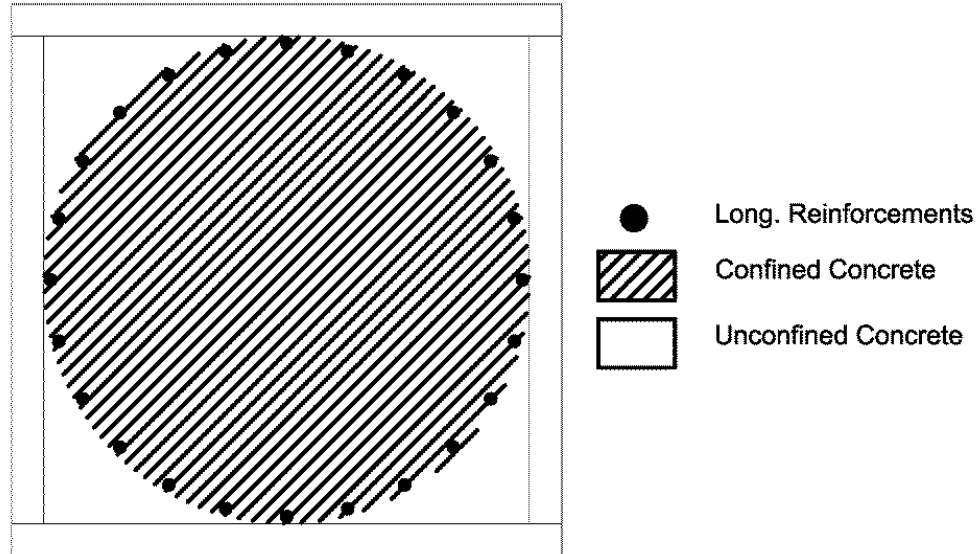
Discretized Column Section for Modeling as Fiber Section in OpenSees.
